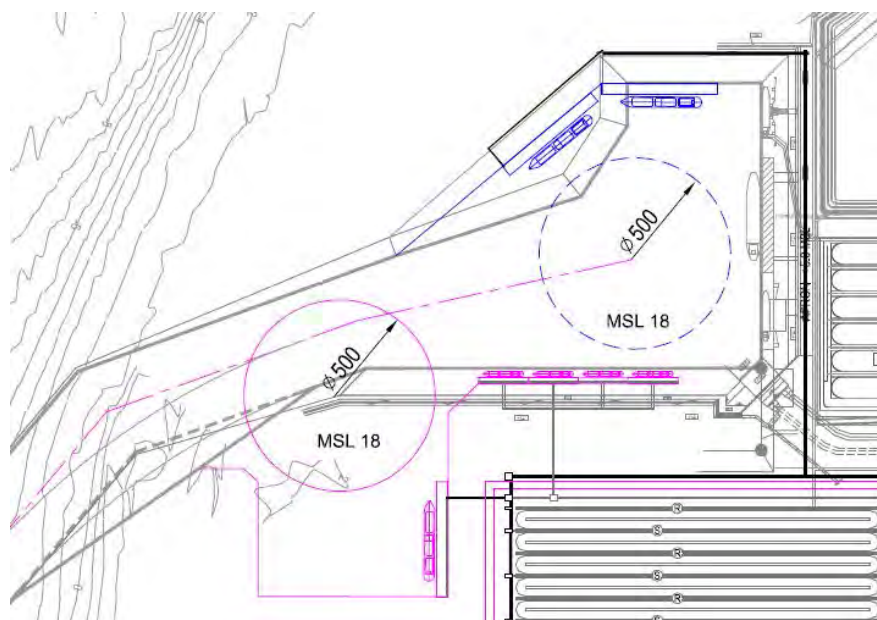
Alternative Layout Plan of Coal Unloading Berth in the 2nd Phase
